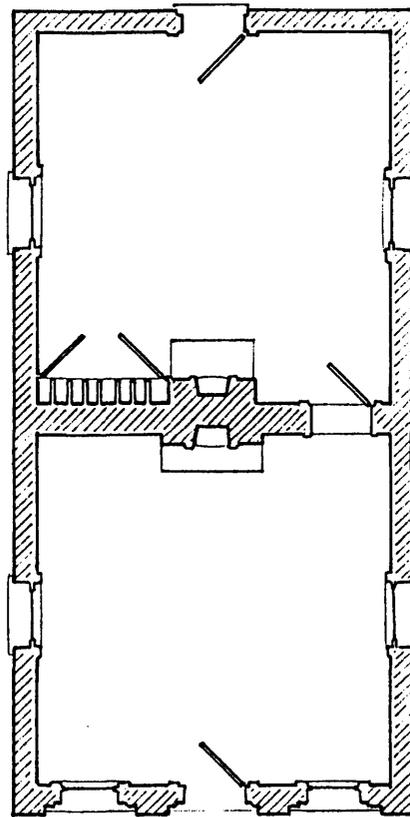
Floor plan of the Hurst Law Office. Scale in Feet
